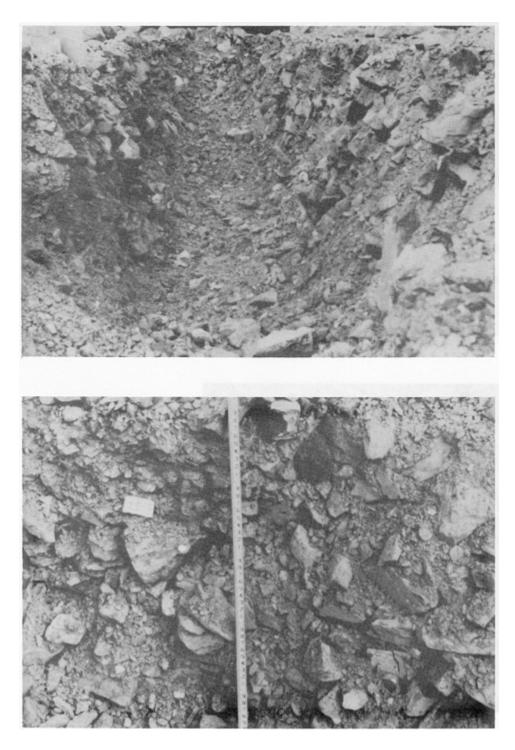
Photographs of rockfill containing appreciable fines, Cerrillos Dam test fill No. 5 inspection trench
